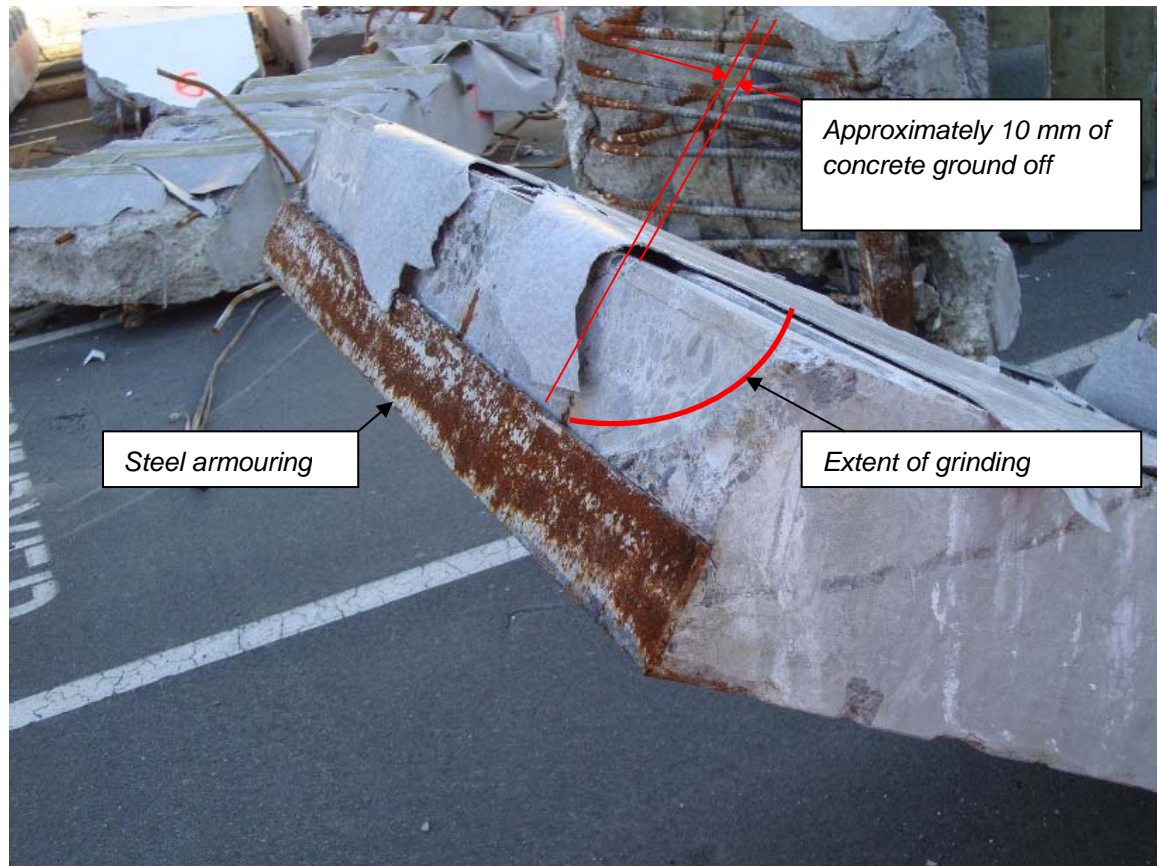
Ground-Back End of Landing in Collapsed Stair Unit
